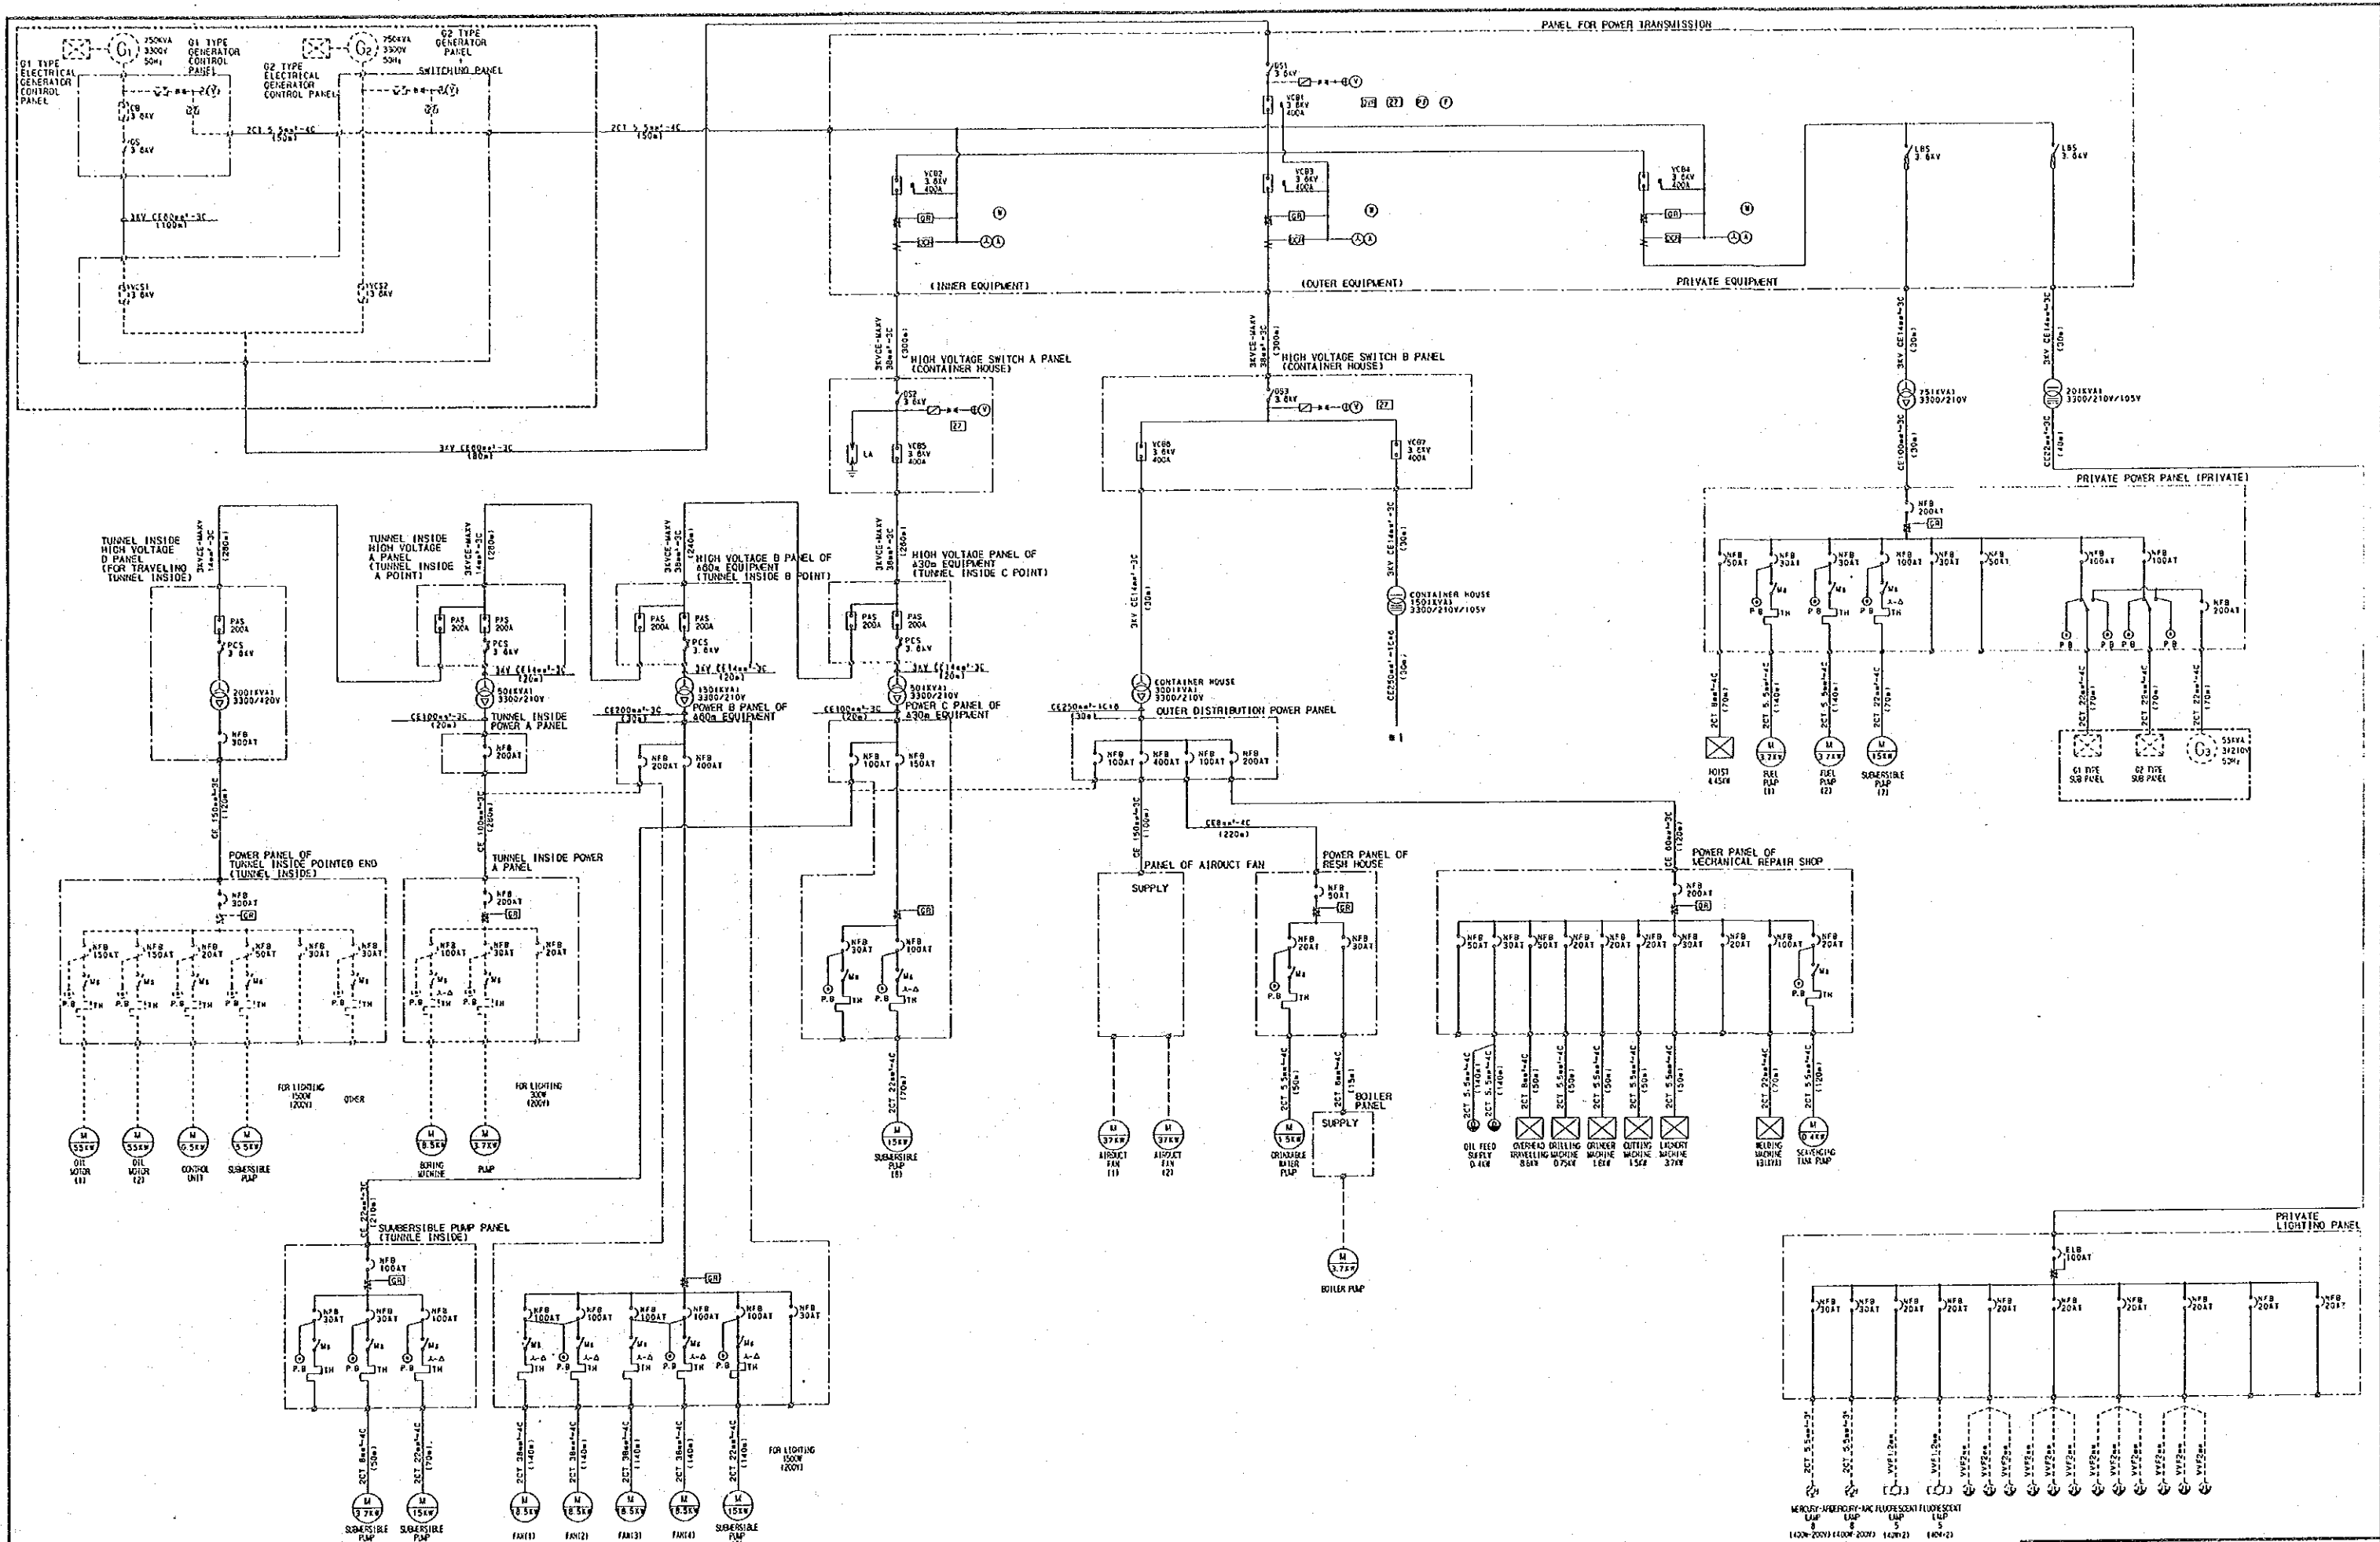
WIRING DRAWINGS ELECTRICAL CABLE (2)
